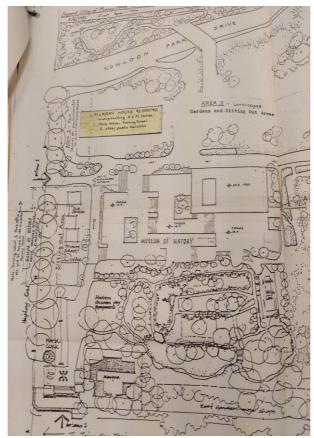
A sketch plan to explore feasibility to resit Murray House in Kowloon Park, 1981. (Source: Public Records Office, File No. HKRS 1105-1-12, document no. 1)
